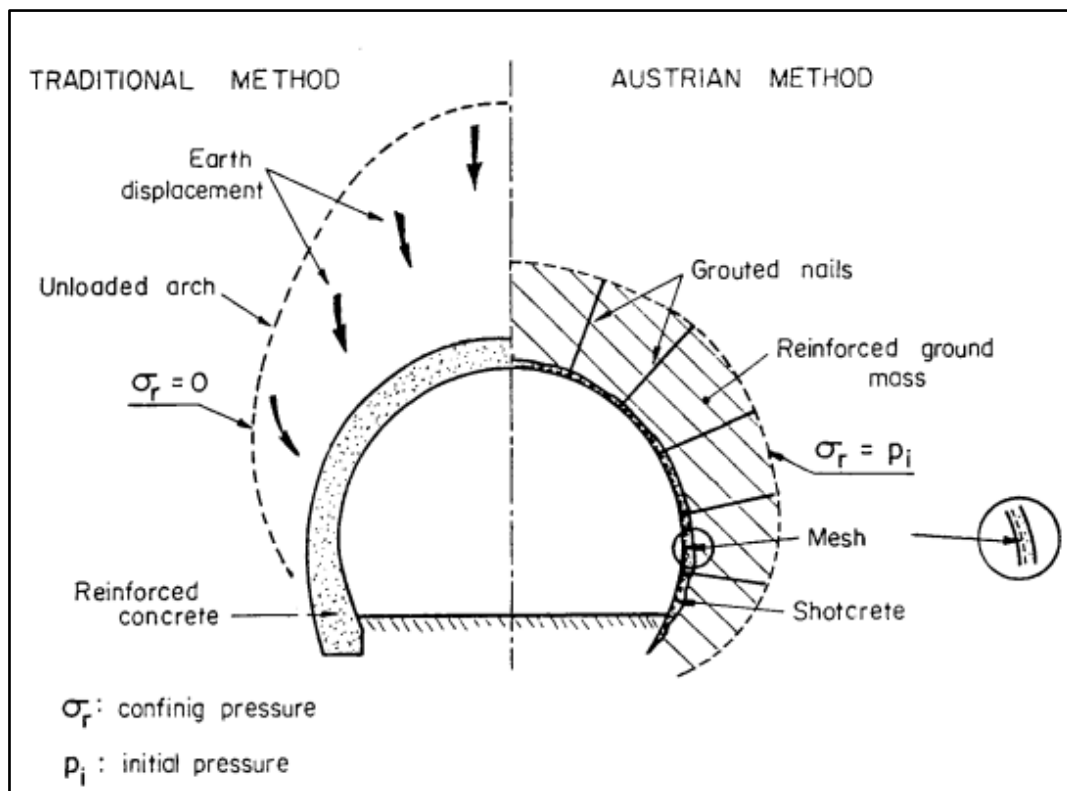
Traditional and Austrian Tunneling Method for Lining A Gallery (Clouterre, 1991)
